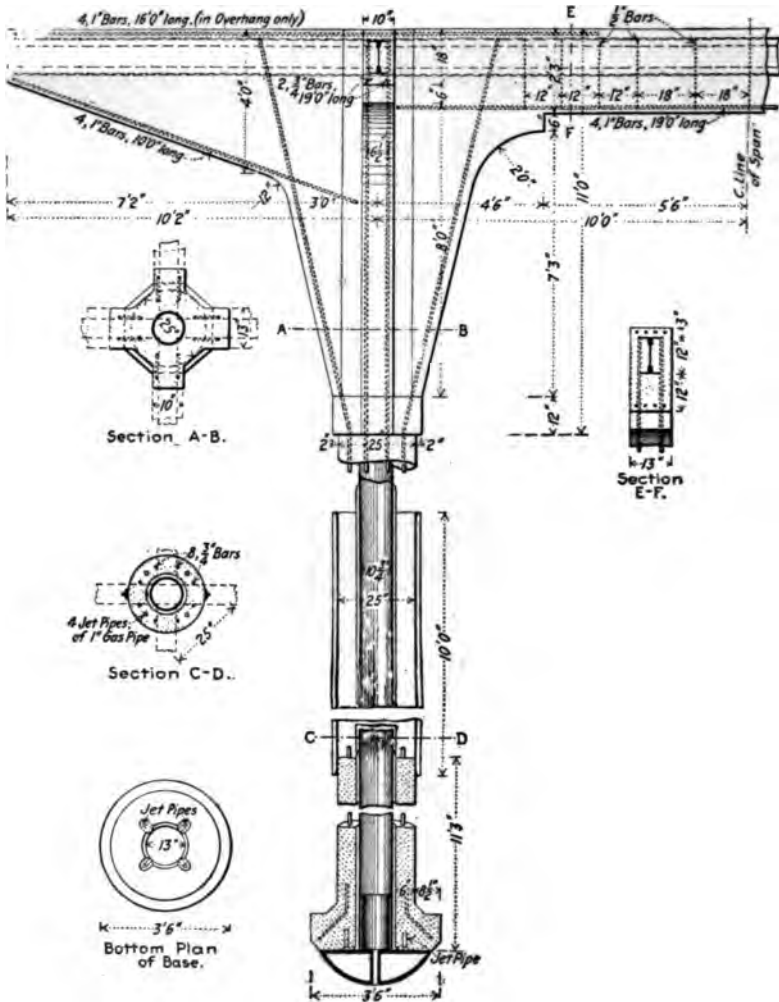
Section Showing Method of Encasing Steelwork of Atlantic City Pier with Concrete.
